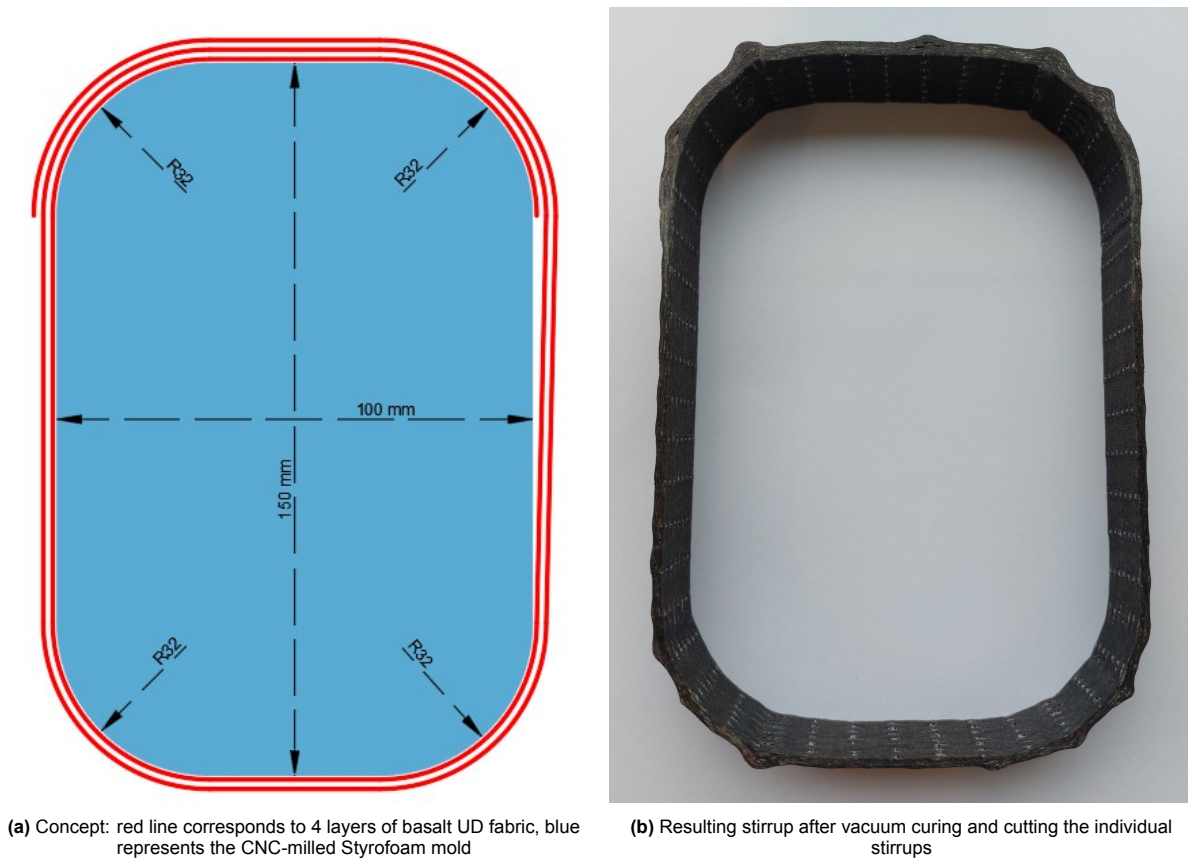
Cross-section of a basalt FRP UD-laminate stirrup
